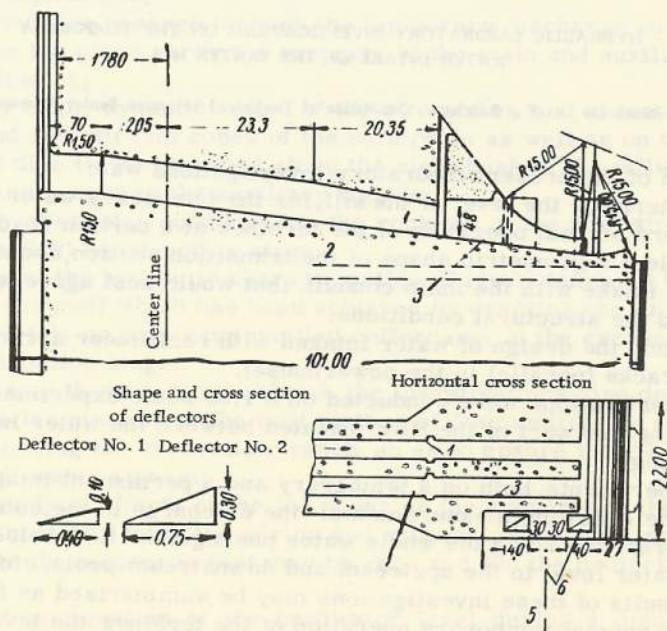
Protection of the supports of a small concrete-transporting trestle (junction of bottom water outlet with the upturned bucket at the tailwater section)
